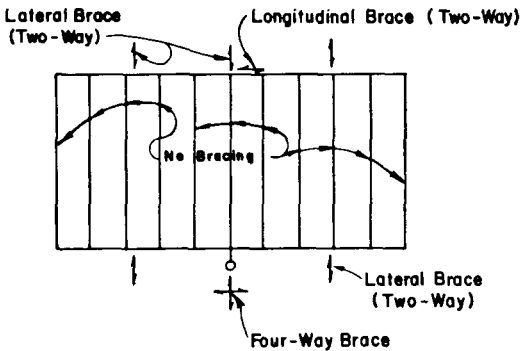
(c) Typical Location of Bracing on a Gridded System.
